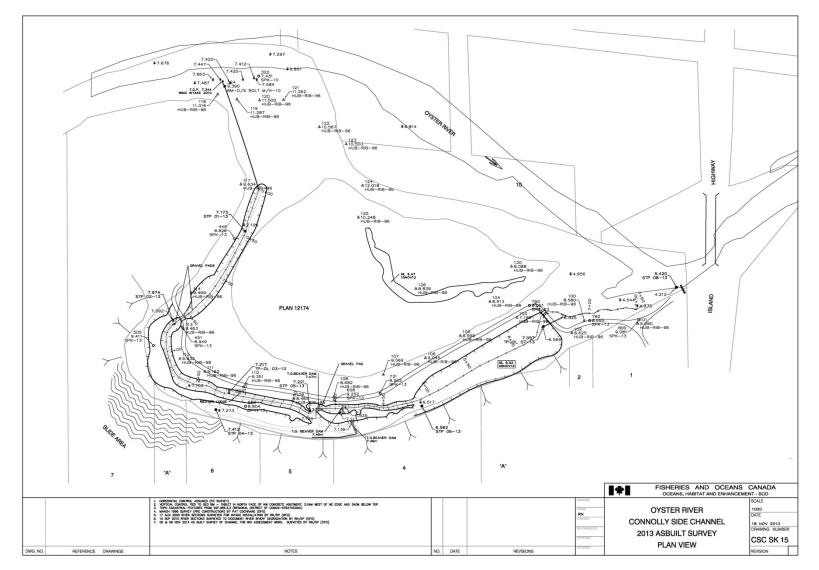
Surveyed site plan of Connolly Sidechannel showing existing condition during the assessment period including elevations of channel features, intake structure and outlet channel, beaver dams, bridge crossings, and spawning gravel locations. (Adapted from DFO; Nov. 18, 2013)
